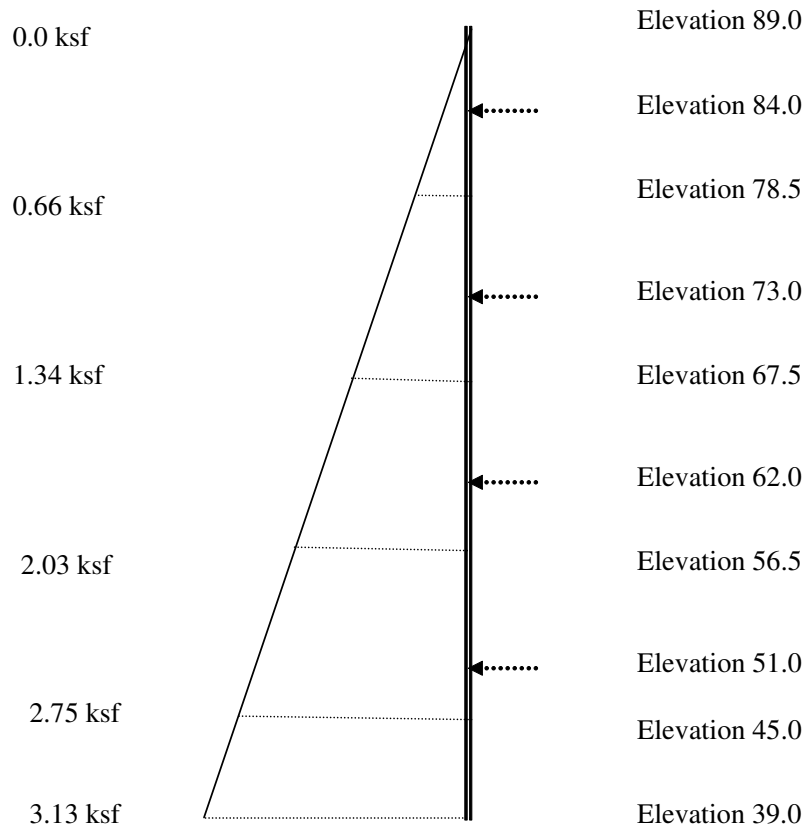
Excavation and tieback locations driving side earth pressures at excavation levels
